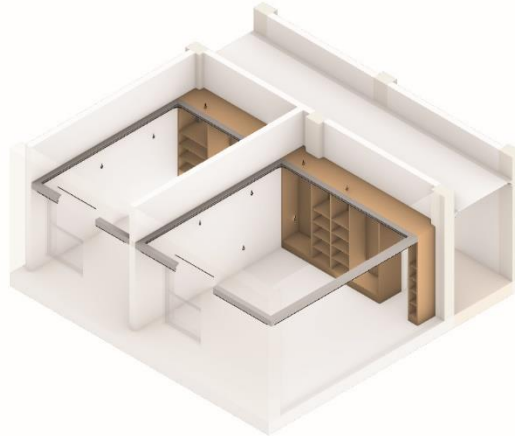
Private space layout showing rail system, ceiling hooks, and storage
